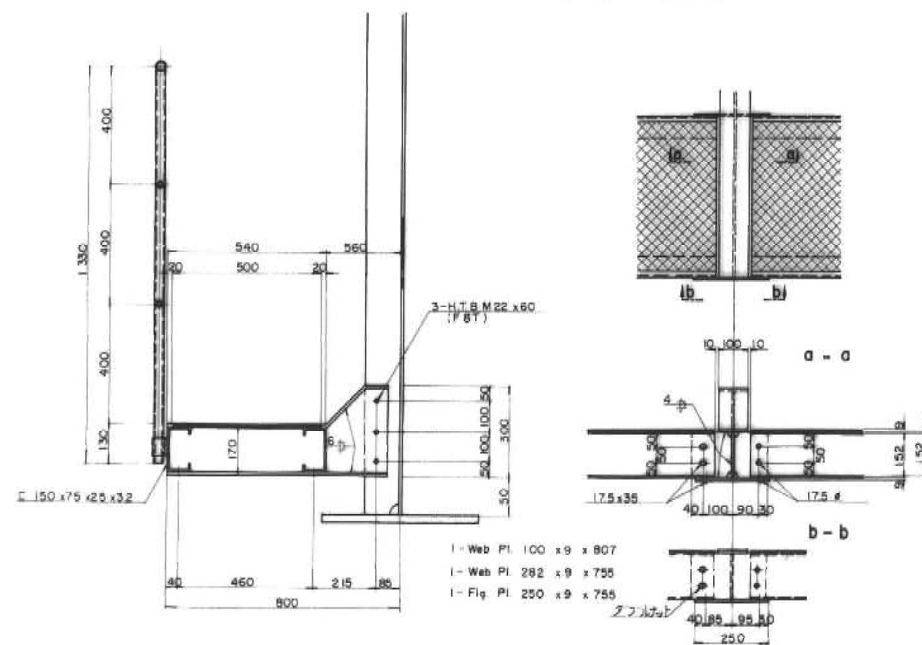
DETAIL OF HANDRAIL SUPPORT SCALE 1:10 CONNECTION PLATE SCALE 1:10
